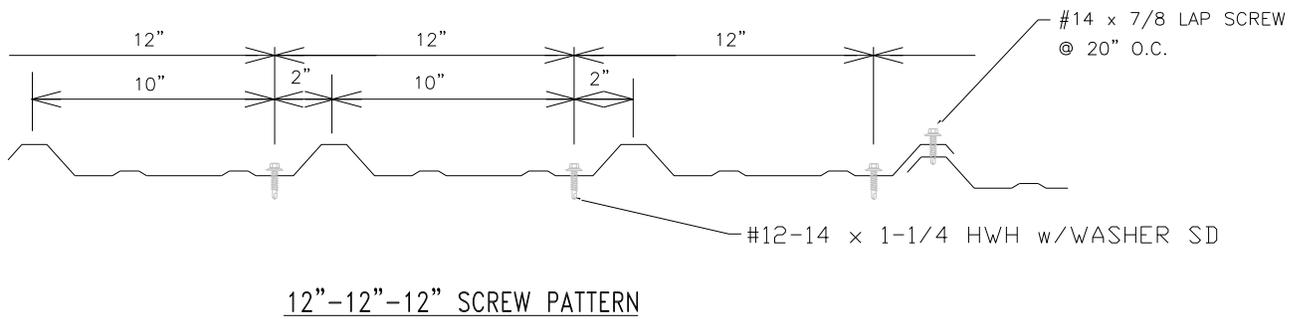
PBR Panel Fastener Pattern Detail (Minimum 26 Gauge Panel)
